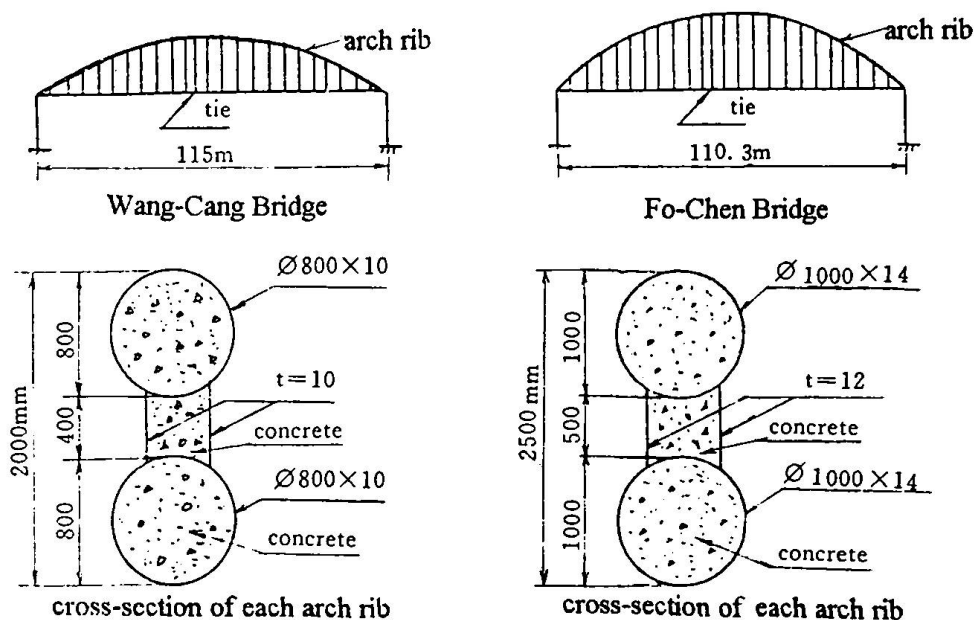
Wang-Cang Bridge and Fo-Chen Bridge
